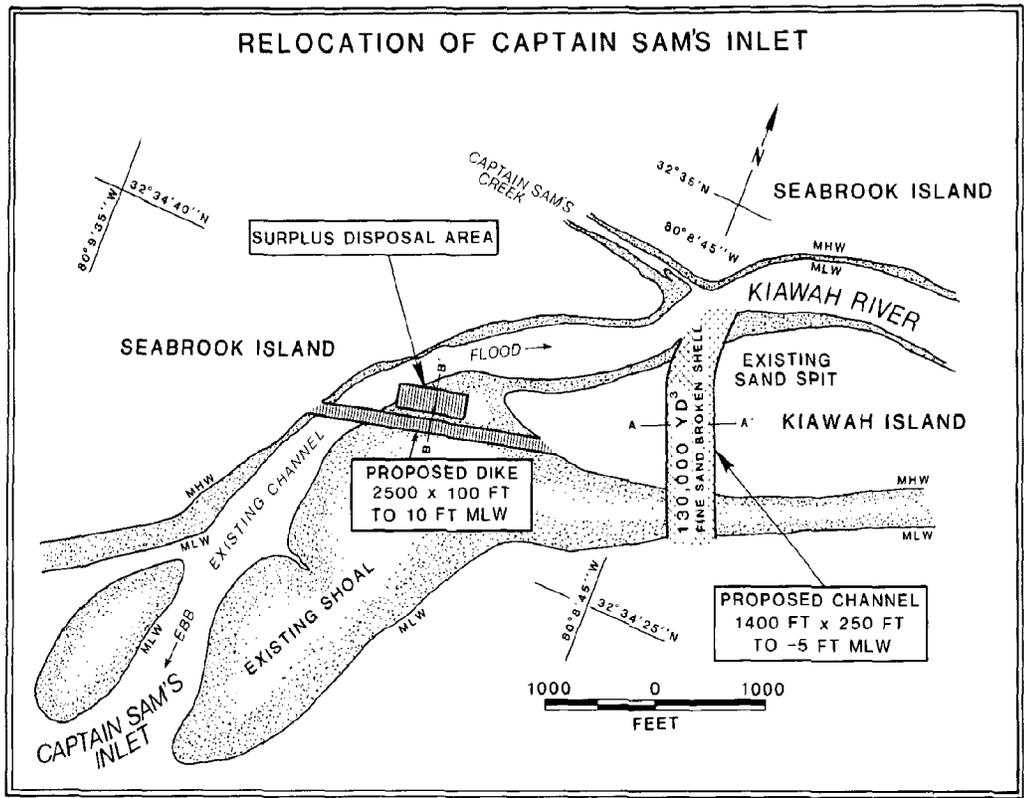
The plan for relocating Captain Sam's Inlet which was completed in February 1983. The project freed a large volume of sand trapped at the mouth of the existing inlet, which is now (October 1983) renourishing the eroding downdrift beach to the southwest.
